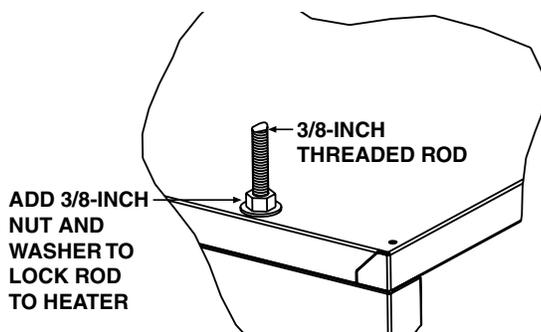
Heater Suspension Using Field-Supplied Threaded Rods
